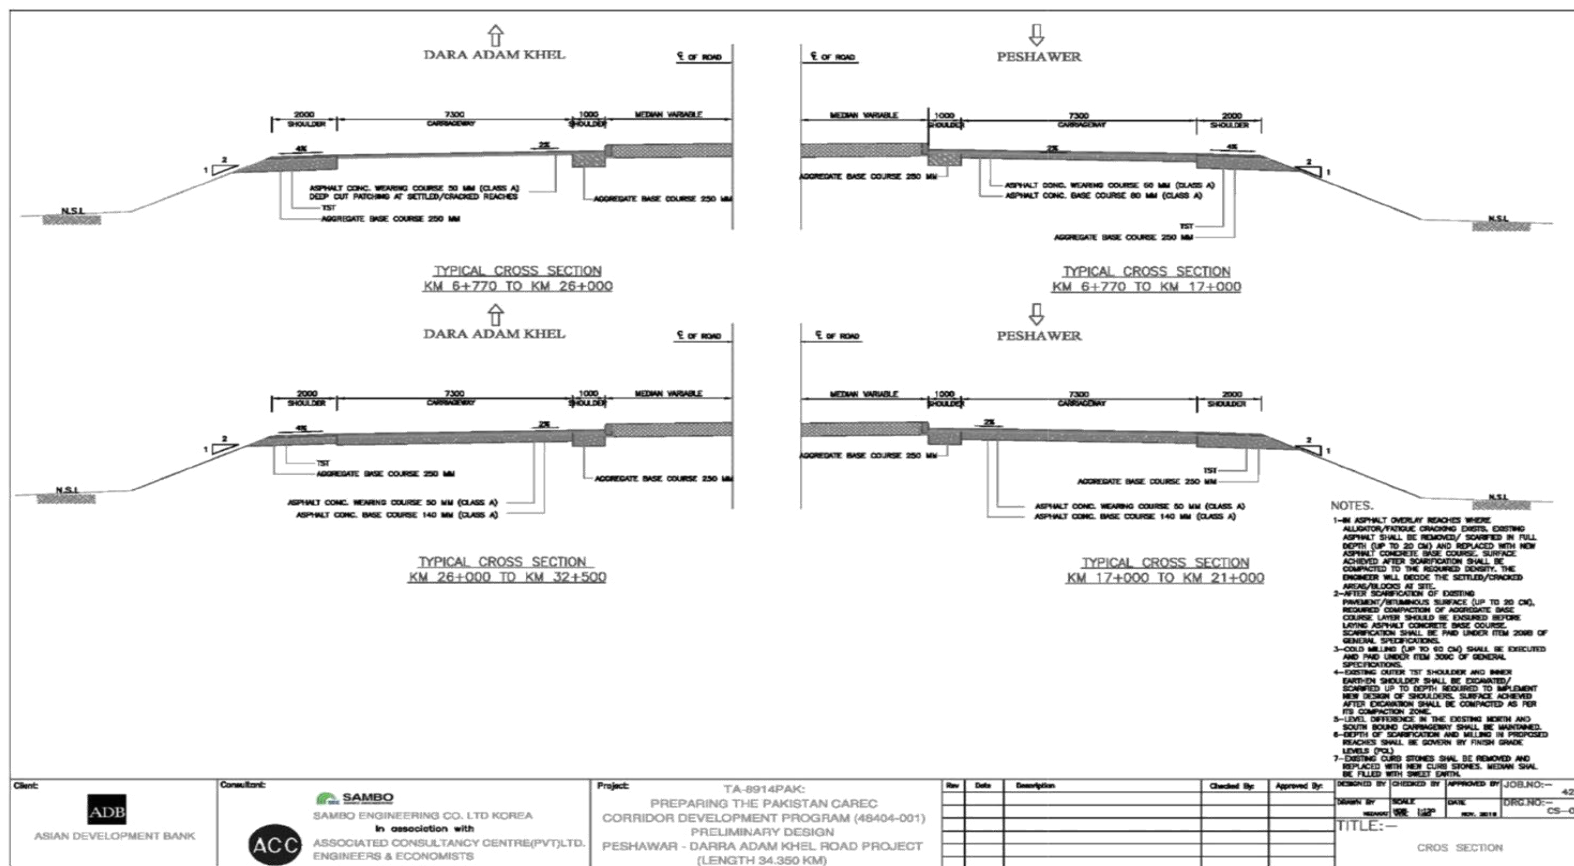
Typical Cross-section of the Road between km 21+000 to 26+000
